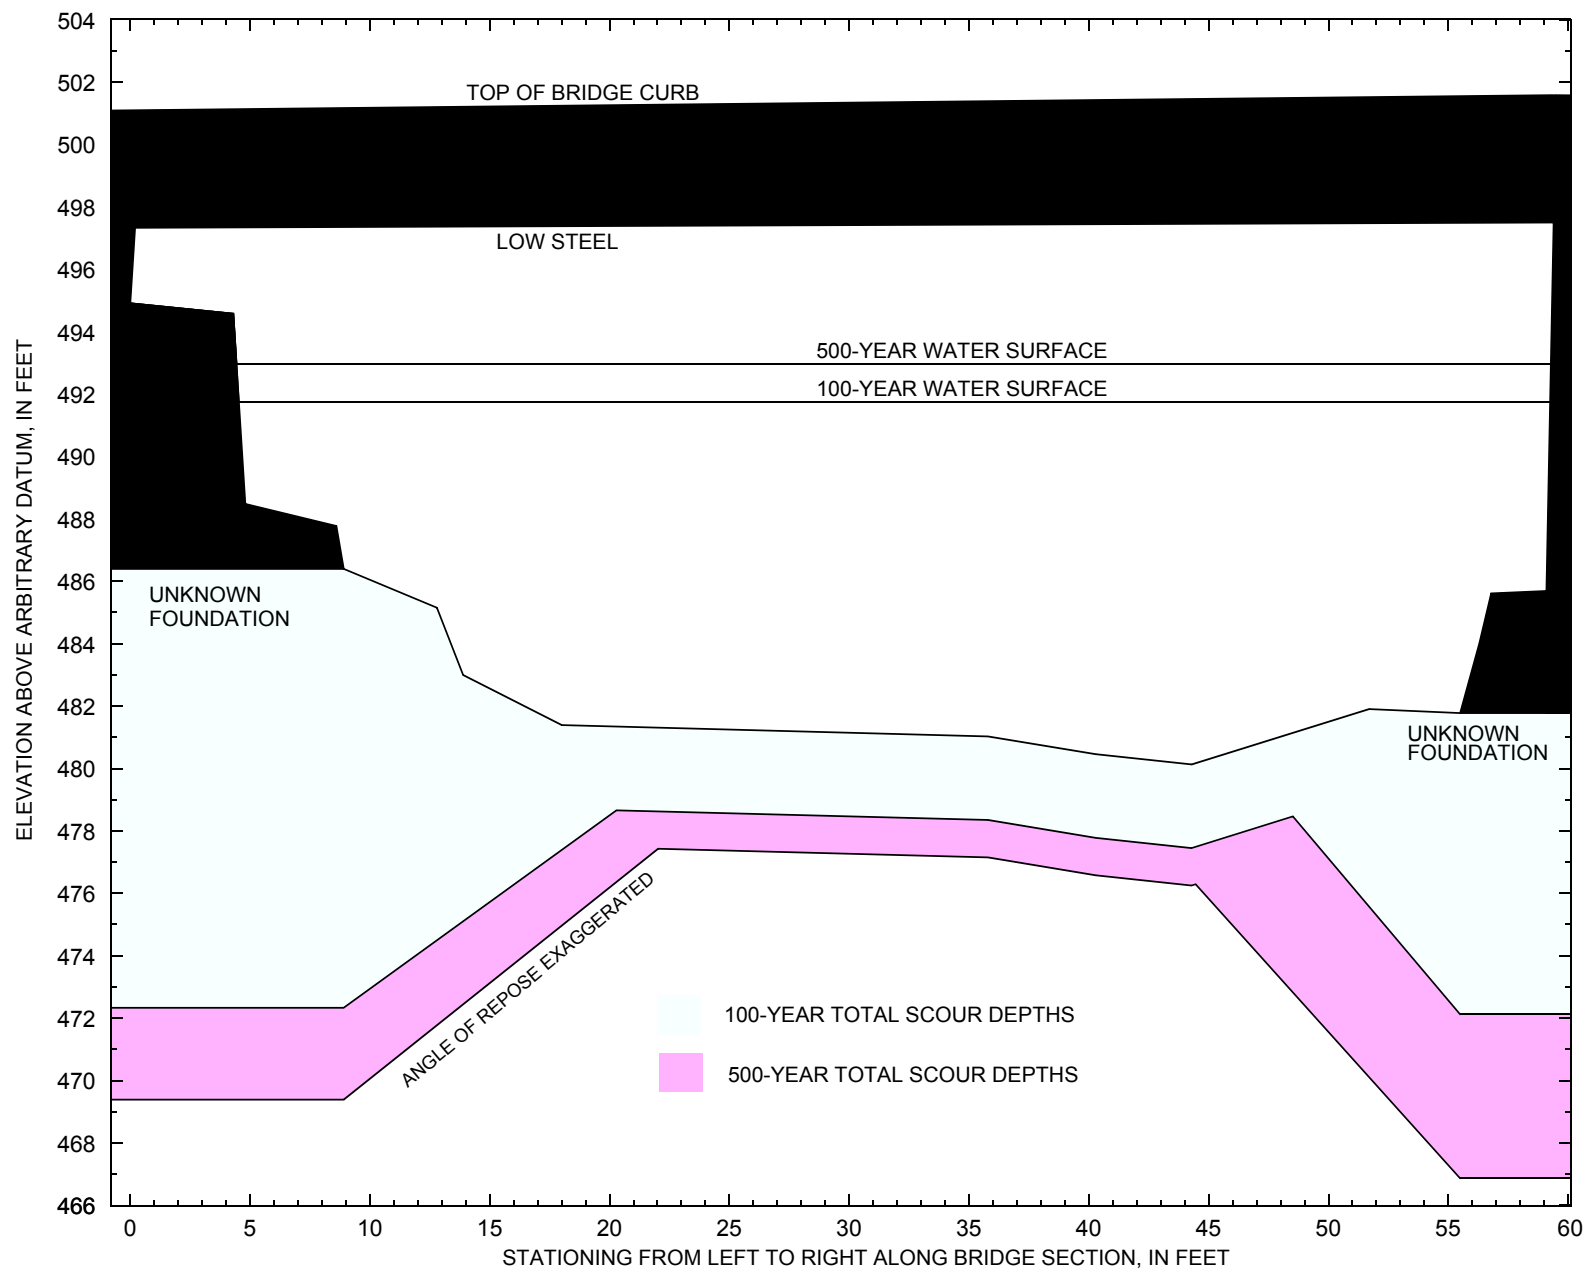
Scour elevations for the 100- and 500-year discharges at structure STOWTH00230052 on Town Highway 23, crossing the West Branch Little River, Stowe, Vermont.
